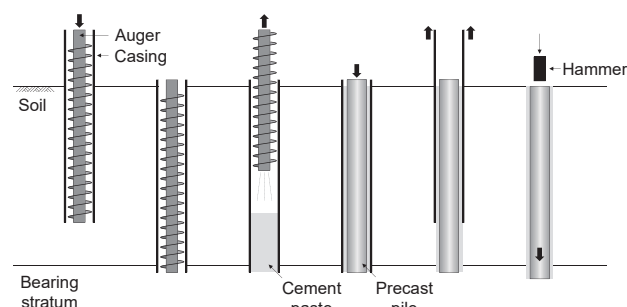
Installation process of embedded pile: (a) excavating hole with auger and casing; (b) reaching bearing stratum; (c) injecting cement paste and uplifting auger; (d) inserting precast pile; (e) extracting casing; (f) final pile driving using drop hammer (modified from Han et al. (2019)).
